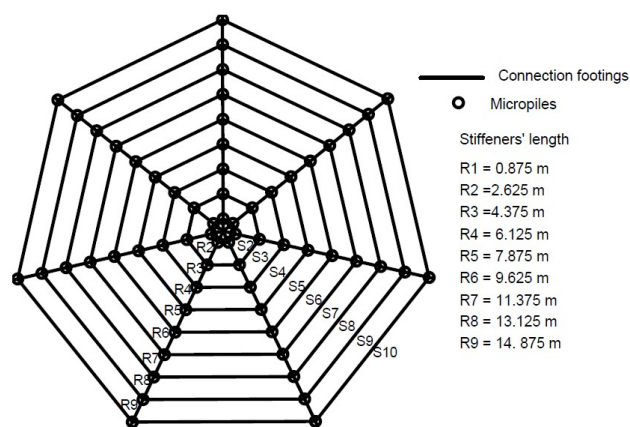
Layout of reinforcing micropiles embedded in reinforced concrete connection beams (Bouassida & Mejri, 2011).
